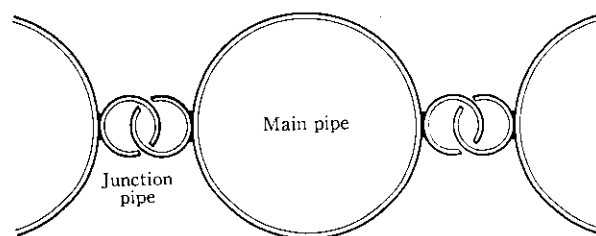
Alternative plan "interlocked steel pipe pile (ISPP)", applied in water intake structure
